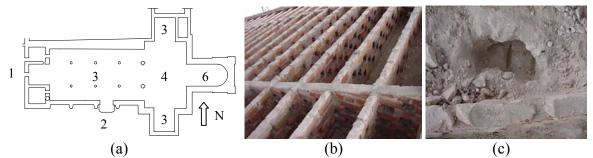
Survey: (a) Plan, with 1 – Axial doorway, 2 – Lateral doorway, 3 – Nave, 4 – Transept, 5 – Side chapels, 6 – Chancel; (b) removal of the roof and existing system to support the roofing tiles; (c) visual inspection of the infill and rib.
